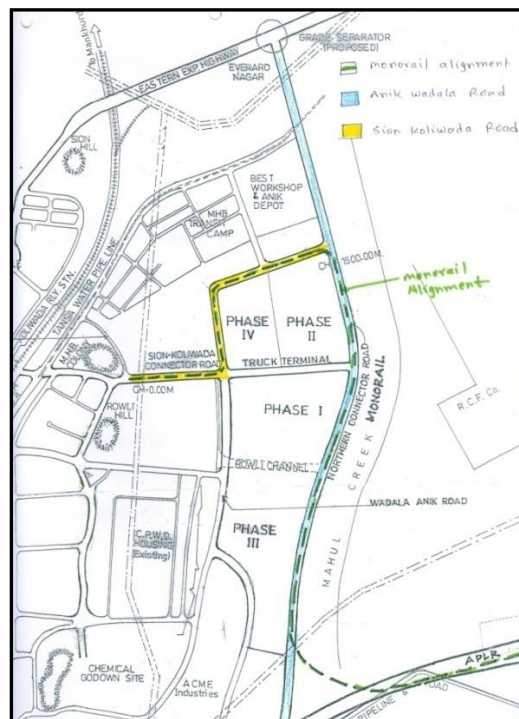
Plan of Monorail Alignment from Wadala Station to Mysore Colony Station
